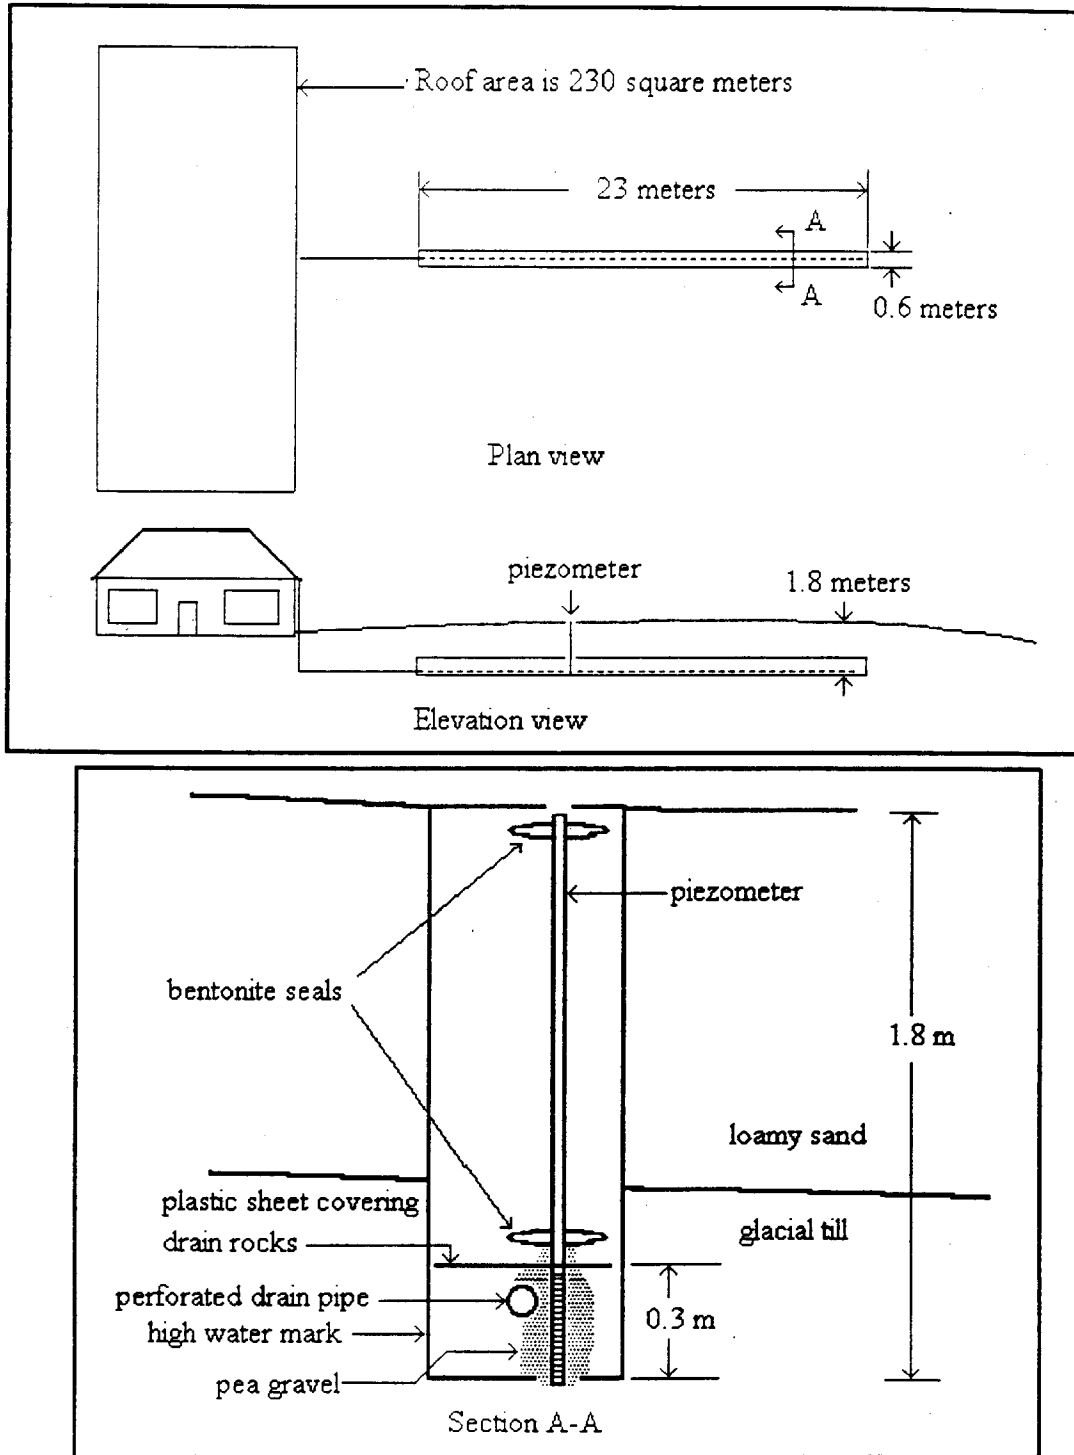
Schematic diagram of Union Hill infiltration trench
